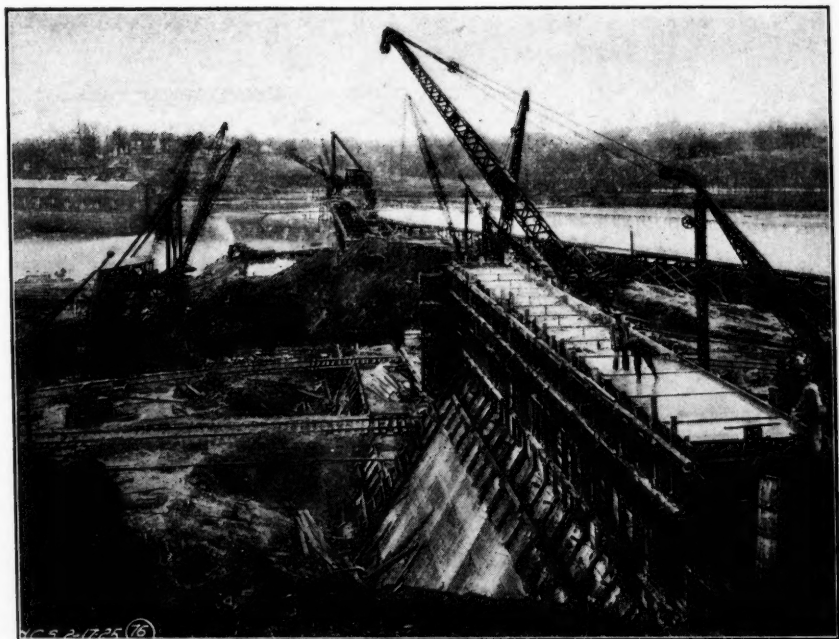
SITE OF NEW POWER HOUSE, SHOWING EXCAVATION WORK
